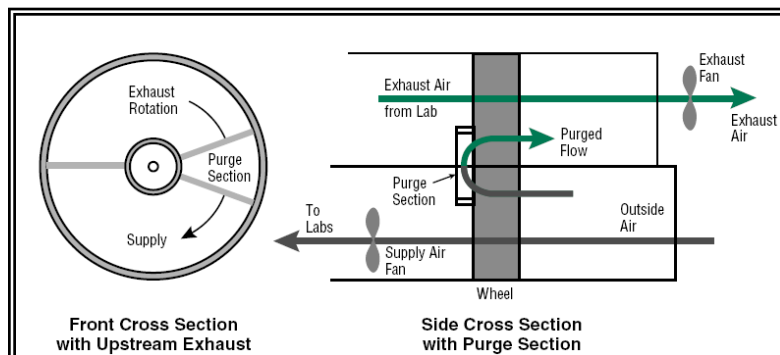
Figure XVI: Cross Sections (Front and Side) of Enthalpy Wheel with Purge Section for Laboratory System (Image Provided by SEMCO, inc.)
